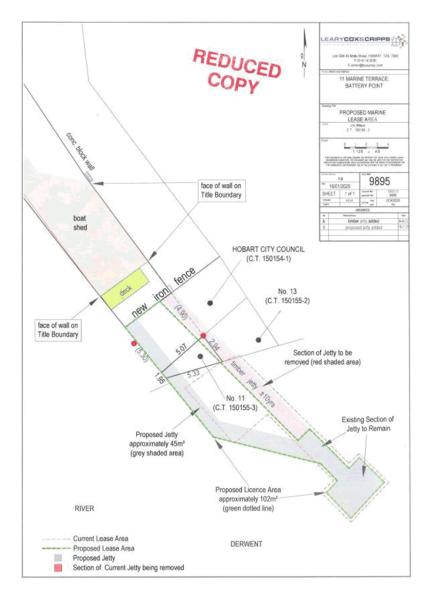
Preview of the jetty reconstruction plan at 11 Marine Terrace, Battery Point.
